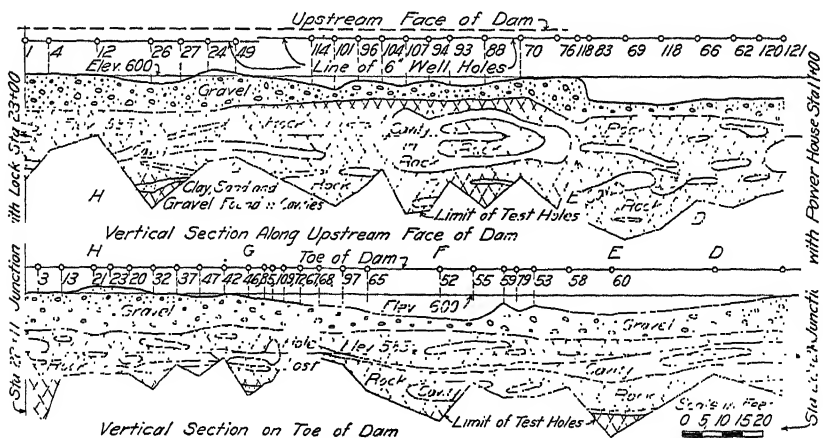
B.—Plan and Profile of Borings at Hales Bar Dam (see page 387).
